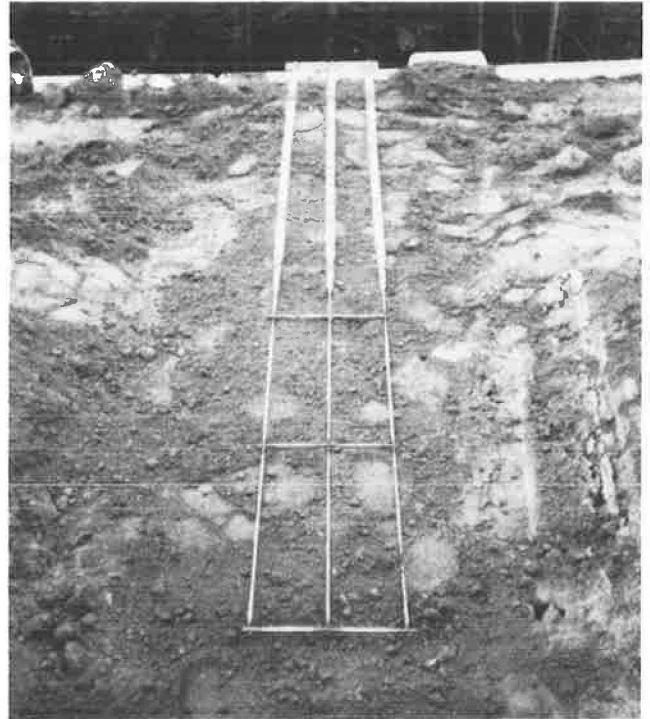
Typical dummy bar-mat (three transverse bars) placed in backfill during construction.
